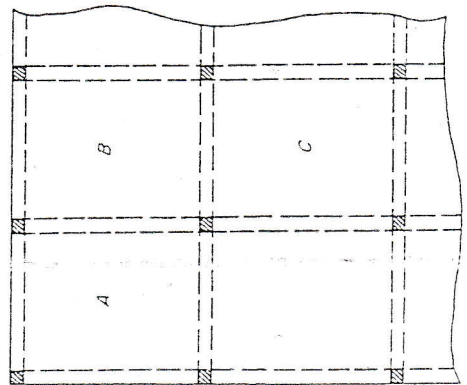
Portion of typical two-way slab floor with beams on column lines.
